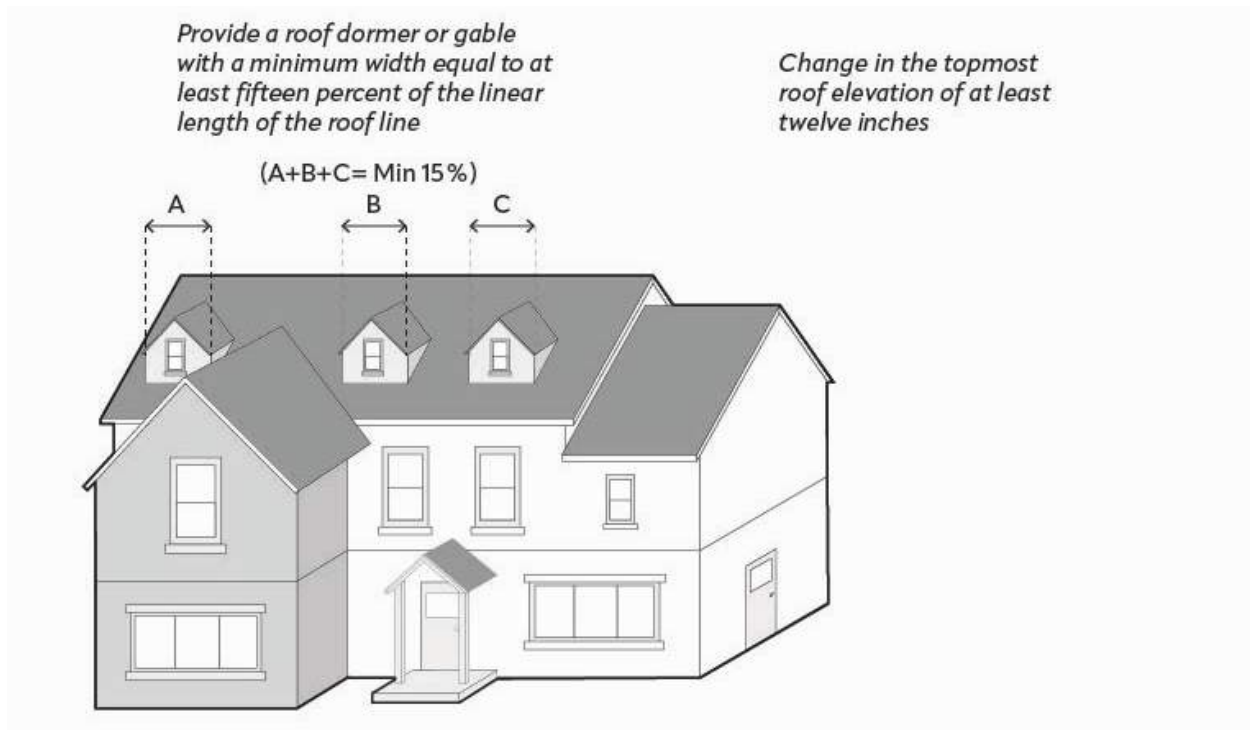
(A)(2)-B: ROOF DESIGN (SHOWING MULTIPLE DORMERS) – SINGLE- TO FOUR-UNITS
